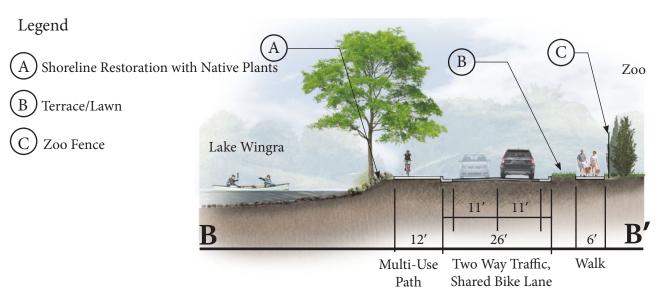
Vilas Park Drive cross-section at section B on plan
